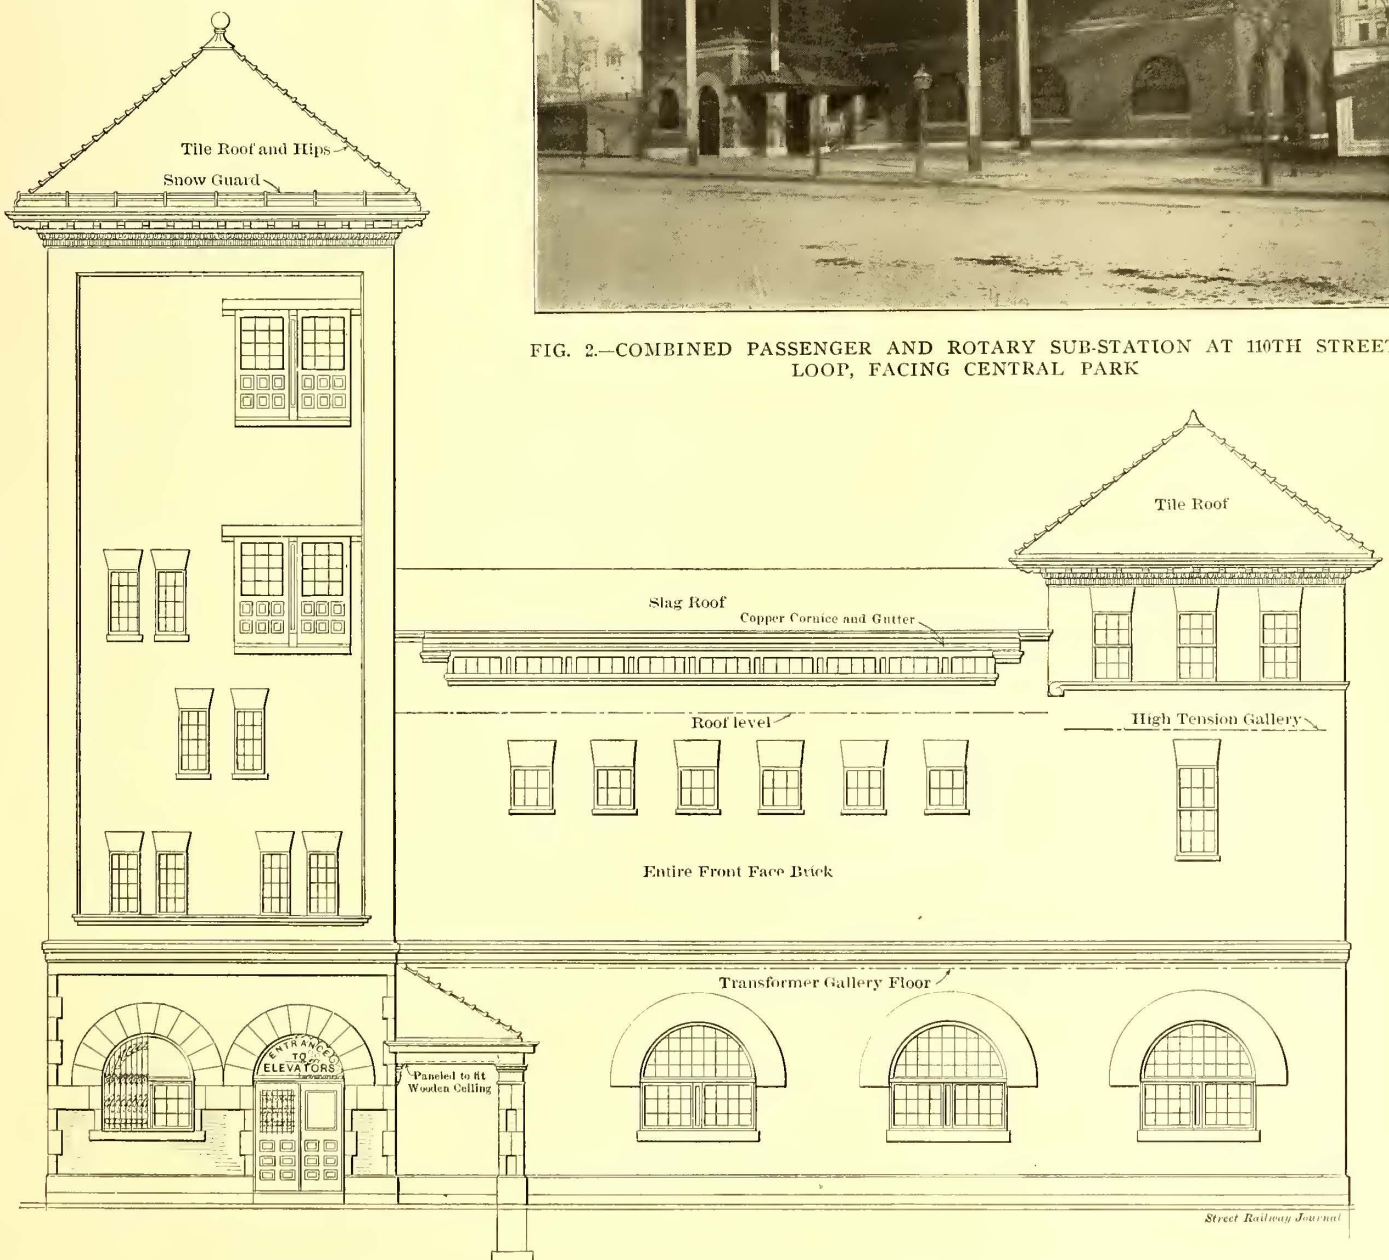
SOUTH ELEVATION OF NO. 4 SUB-STATION, AND ELEVATOR TOWER FOR PASSENGER STATION
